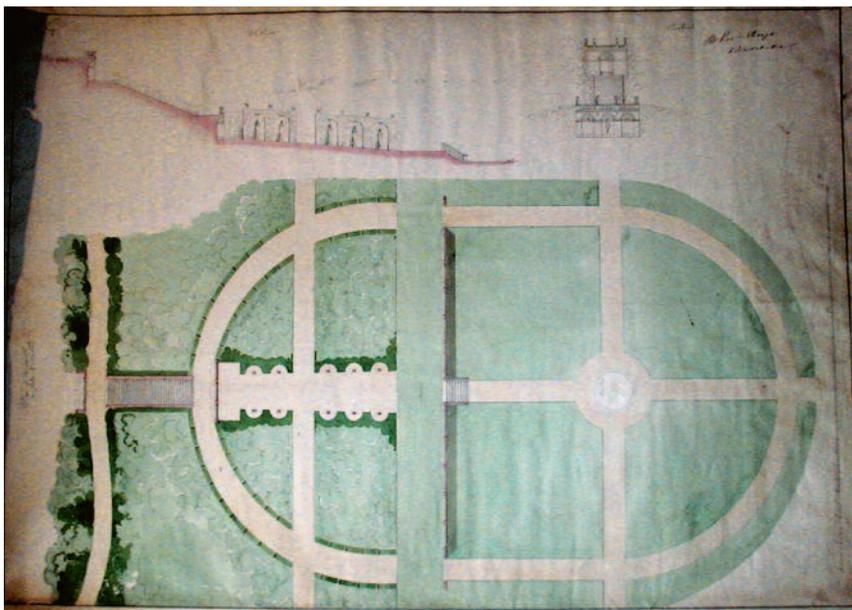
Alexander Roos, Shrubland Park, proposal plan for the Fountain Garden (intersected by the Green Terrace) and Grand Ascent, the latter also in section and elevation, c.1841.
